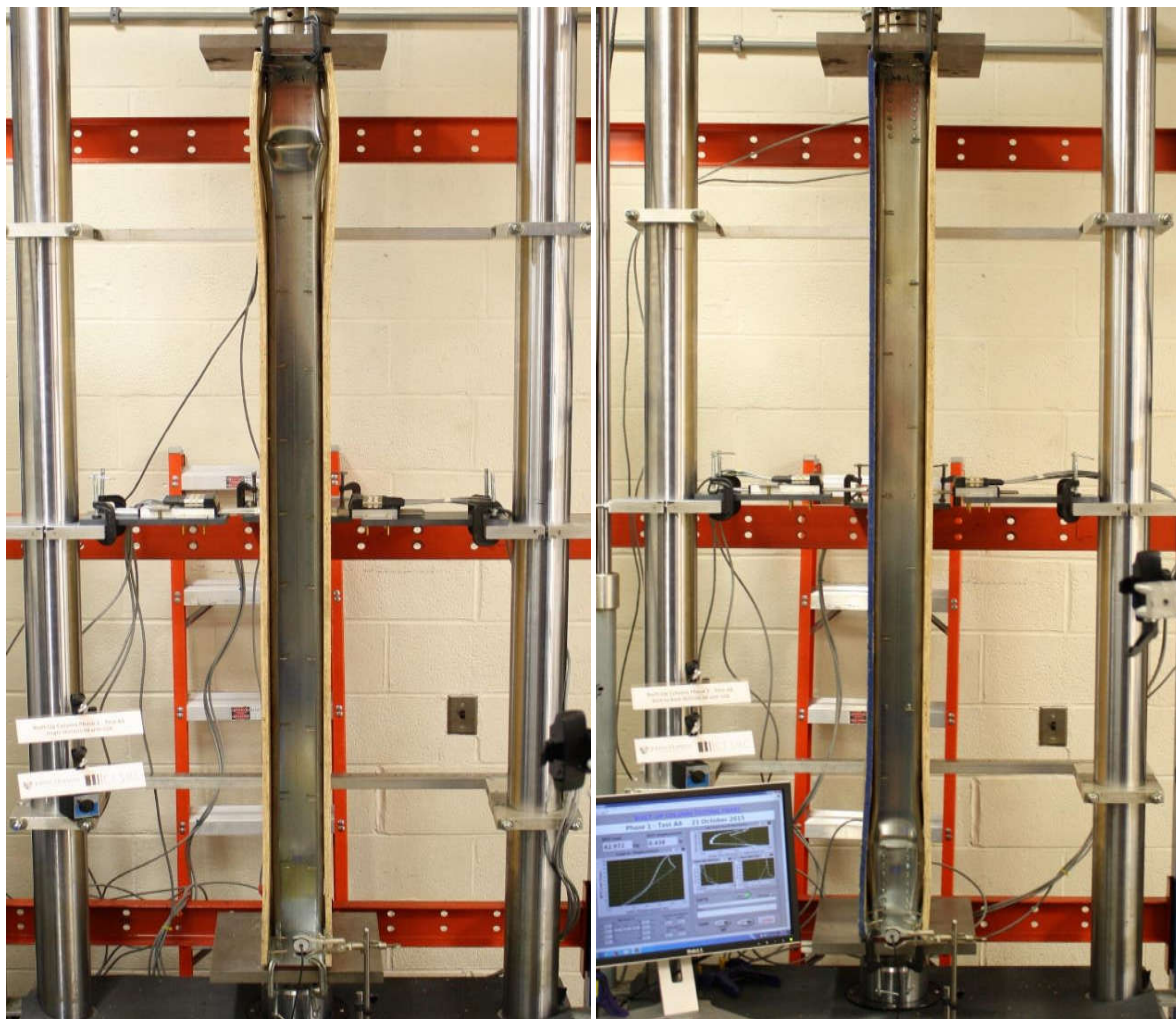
Typical single stud (left, trial A5) and built-up column (right, trial A8) web local buckling failures.
